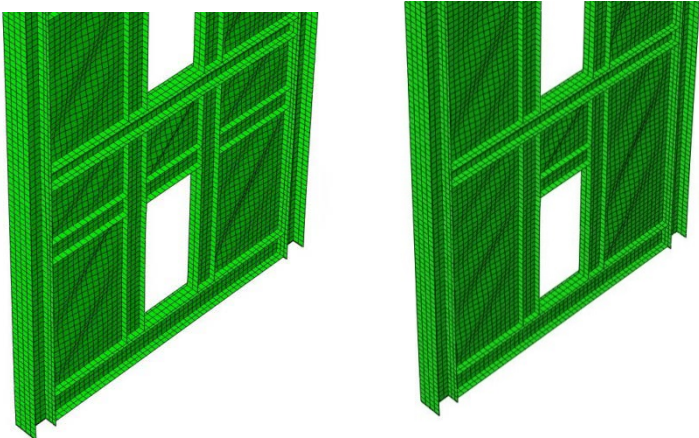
The deformation of steel plates around the opening for 3- storey SPSWs with: stiffeners arrangement according to AISC (model-2)(left); proposed stiffener arrangement (model-1) (right)
